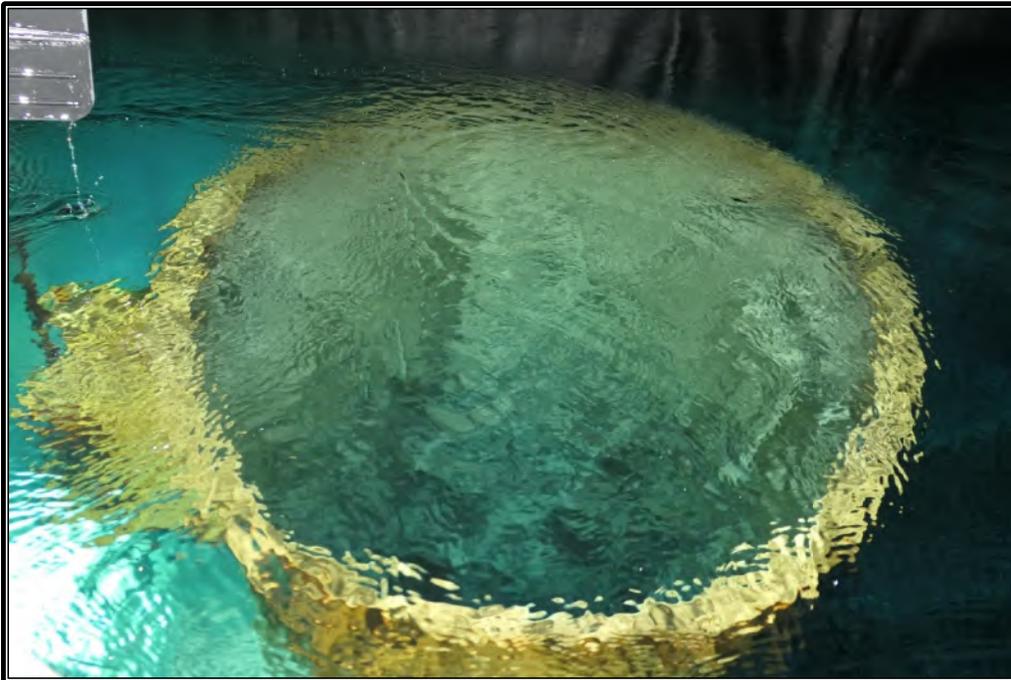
Whatcom Falls 2 – Submerged Inlet Pipe
